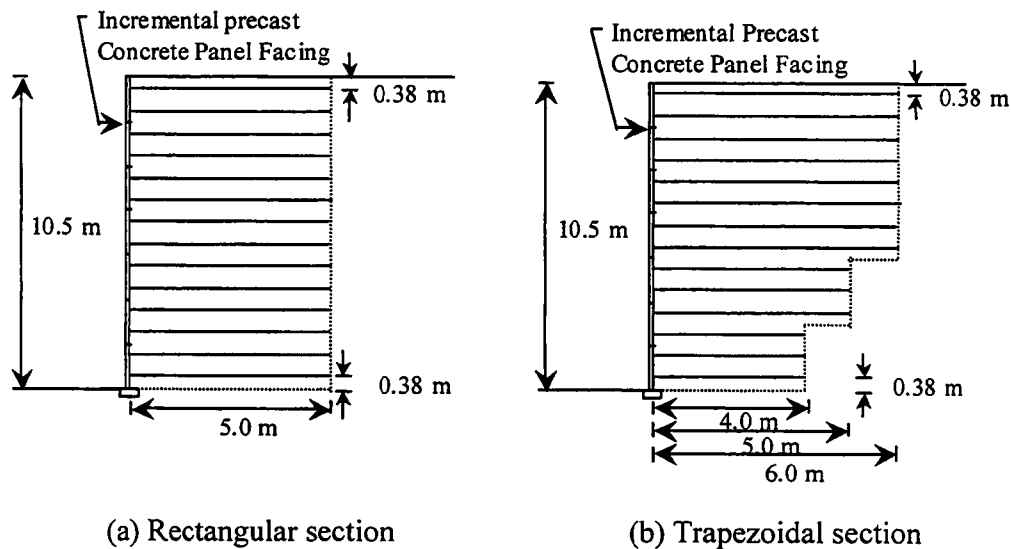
Bourron Marlotte steel strip MSE test walls (adapted from Bastick et al., 1993).
